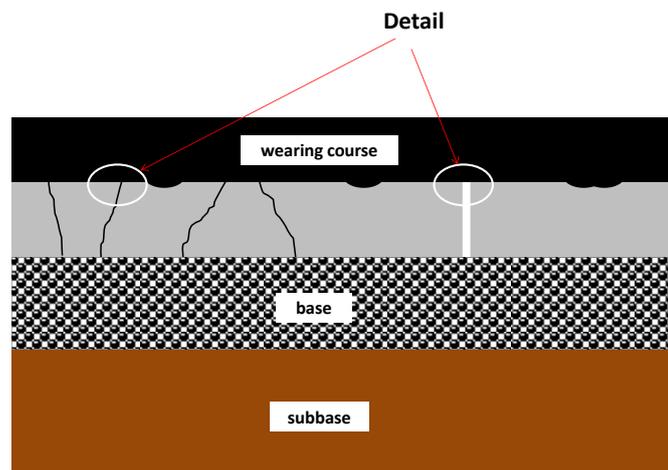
The situation when top asphalt layer is installed over cracked concrete (detail on figure 3).
